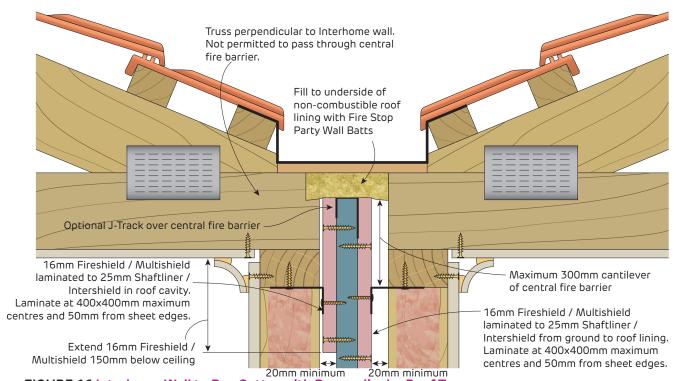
Interhome Wall to Box Gutter with Perpendicular Roof Trusses
